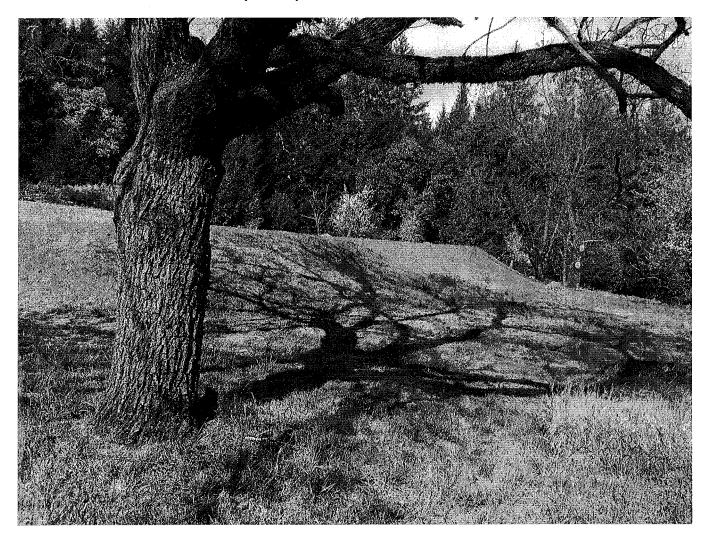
Photo of pond's spillway. The spillway was constructed to achieve a freeboard height of approximately 2-3 feet height. Photo date 4-9-2016.
